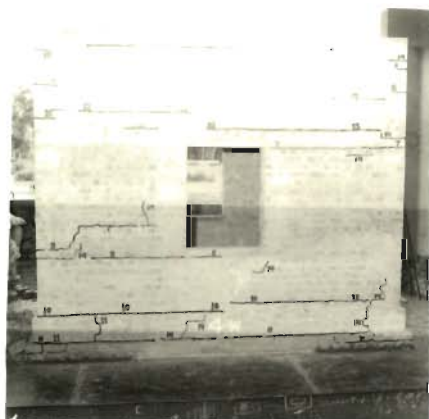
\_ WELL DISTRIBUTED HORIZONTAL CRACKS IN WEST CROSS - WALL (MODEL 4)
